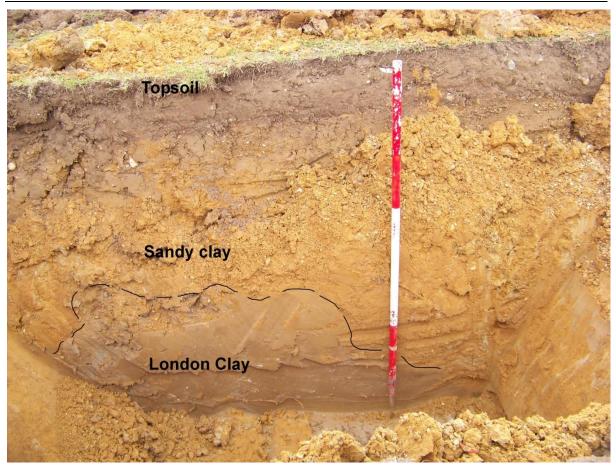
Test Pit 5, Ormiston Academy, Aveley, Essex
